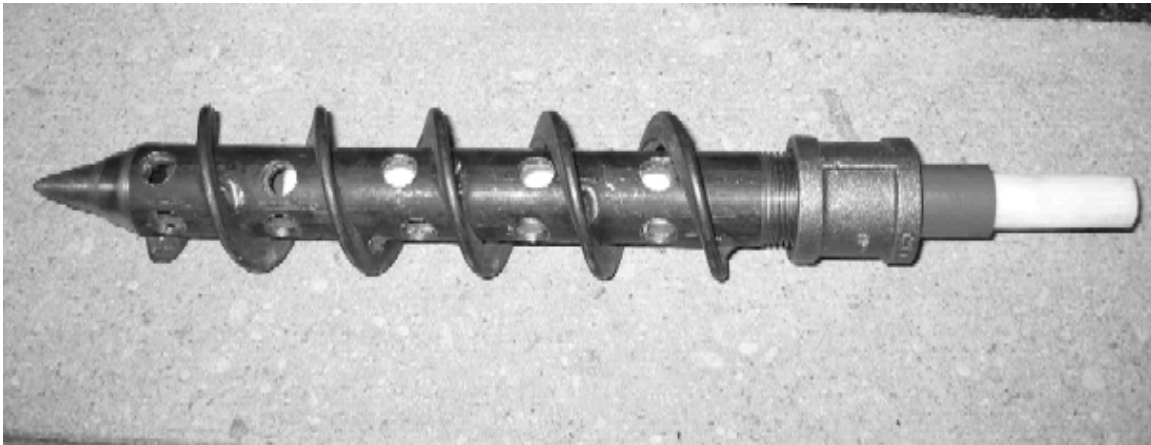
Fluting welded at the bottom of the benchmark piezometers to anchor them in place
